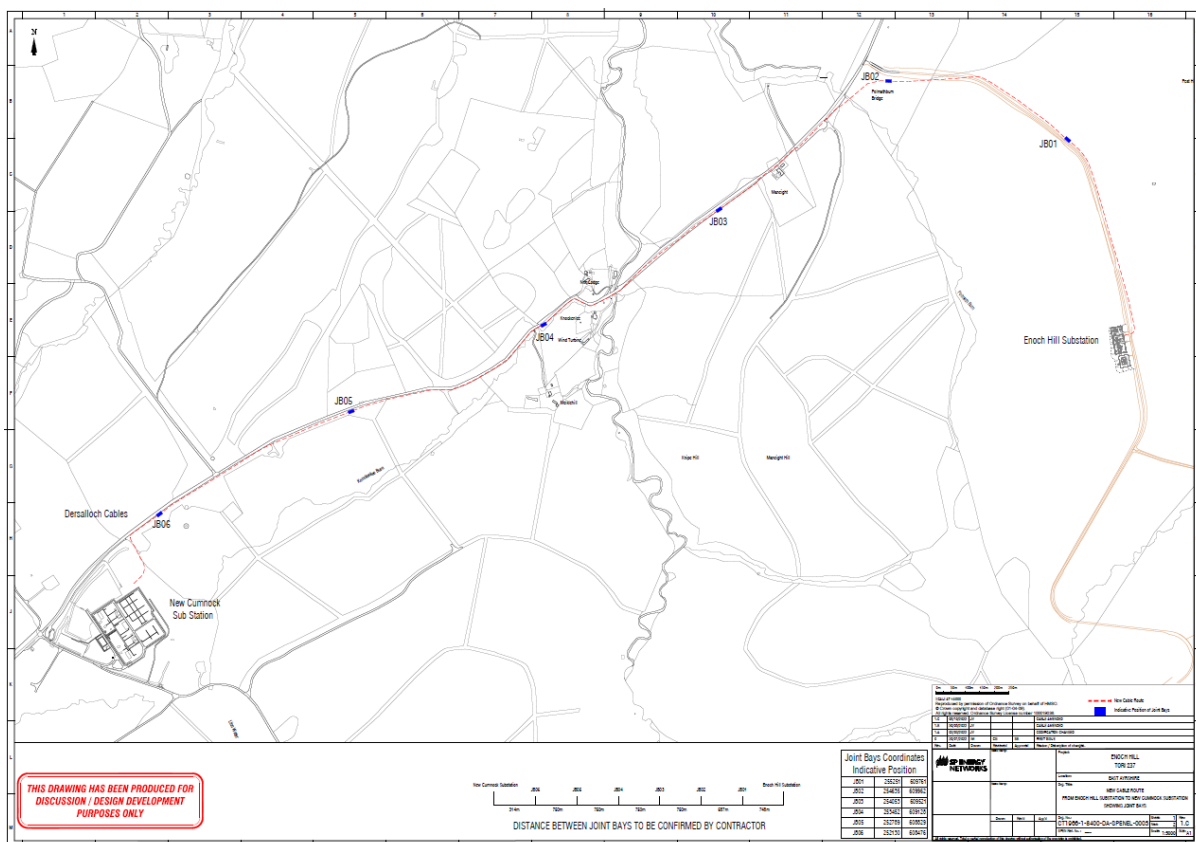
Proposed 132kV Cable Route, New Cumnock to Enoch Hill 132/33kV Substation
